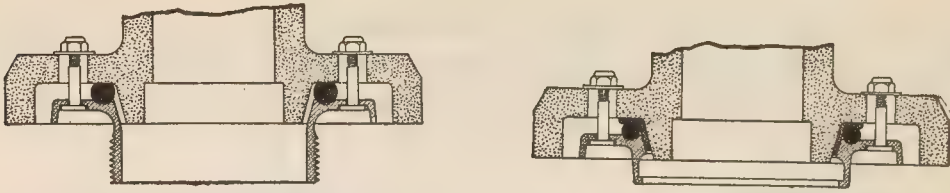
,597.—Standard cast iron closet floor flange (for Universal outlet bowls) with asbestos ring gasket and bolts, *for caulking into soil pipe*.
